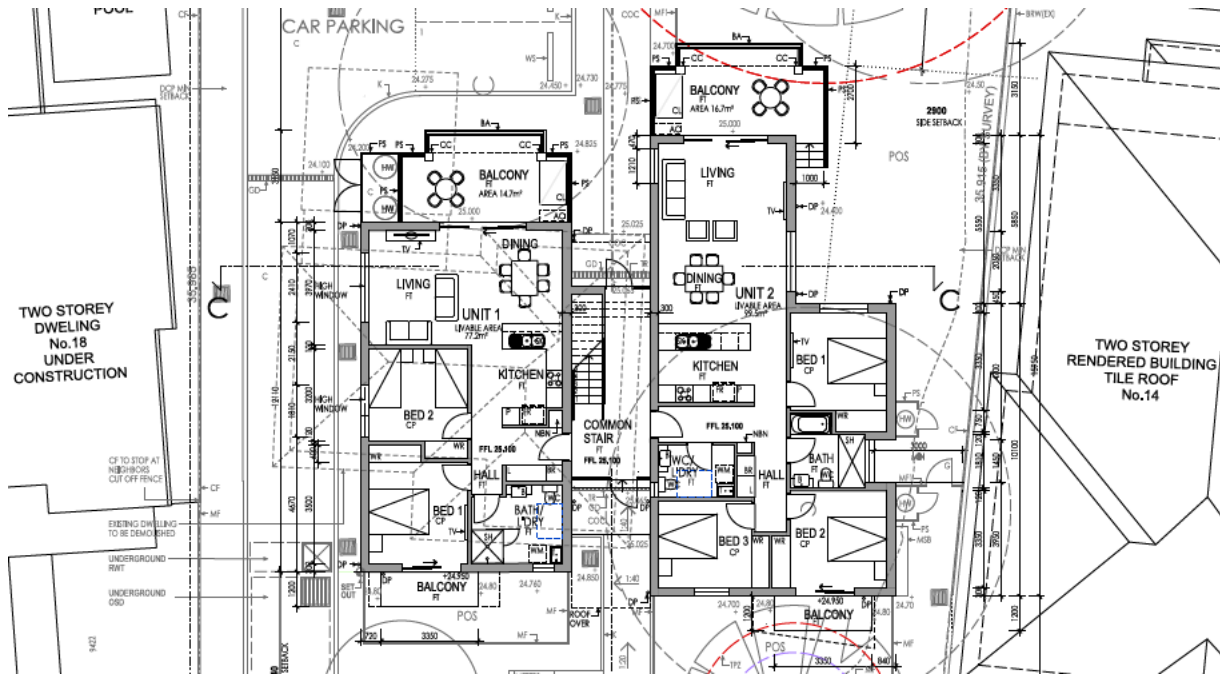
Extract of Ground Floor Plan (Source DKT Studio)
